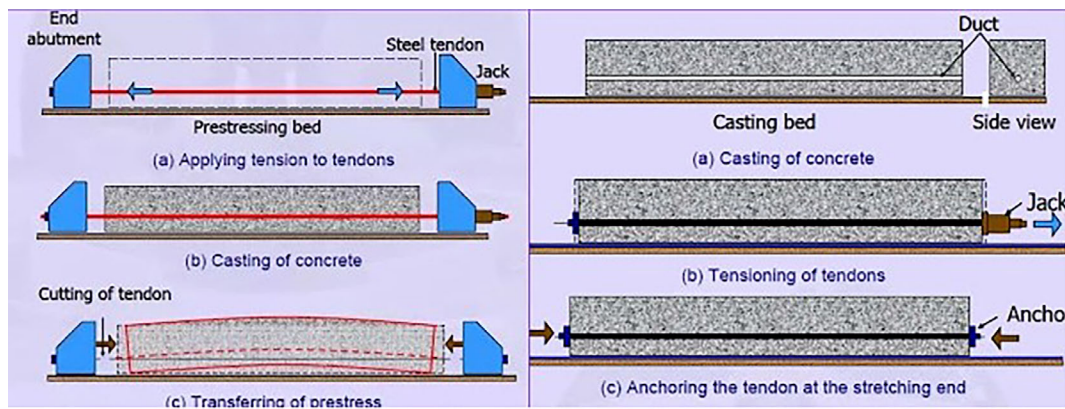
Schematic representation of the pretensioning and posttensioning methods.²⁰ In pretensioning (left side), the tension is applied to the tendons before the casting of the concrete. The prestress is applied to the concrete element through bond between the concrete and the tendons. In posttensioning (right side), the tension is applied to the tendons after the casting of the concrete. The tendons are enclosed in ducts, generally filled with grout after the application of the prestress. Hence, the prestress is applied to the concrete element by means of wedge actions occurring at the anchorages of the tendons, and not by bond
